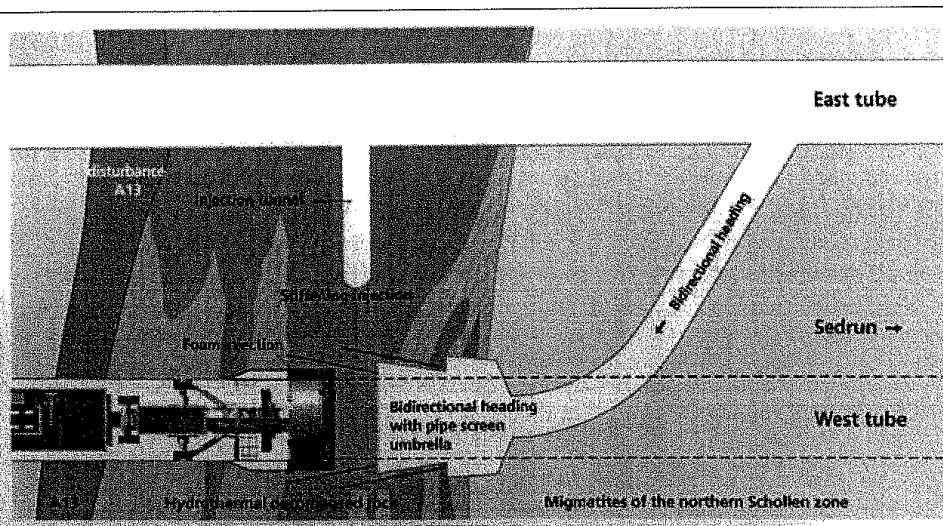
Plan view of a TBM tunnelling in a weakness zone and excavation method at Amsteg, Gotthard Base Tunnel project – Switzerland (from Heinz Ehrbar, 2008).
